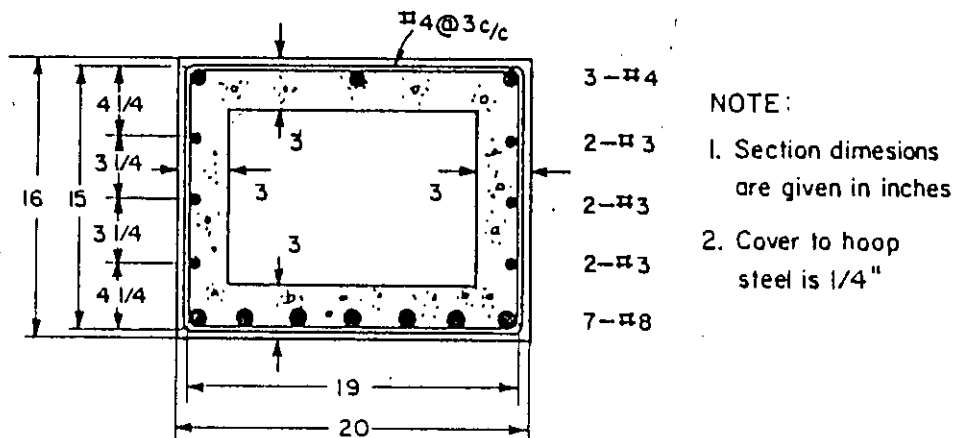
CROSS-SECTION OF HOLLOW SPECIMENS AS DESIGNED
